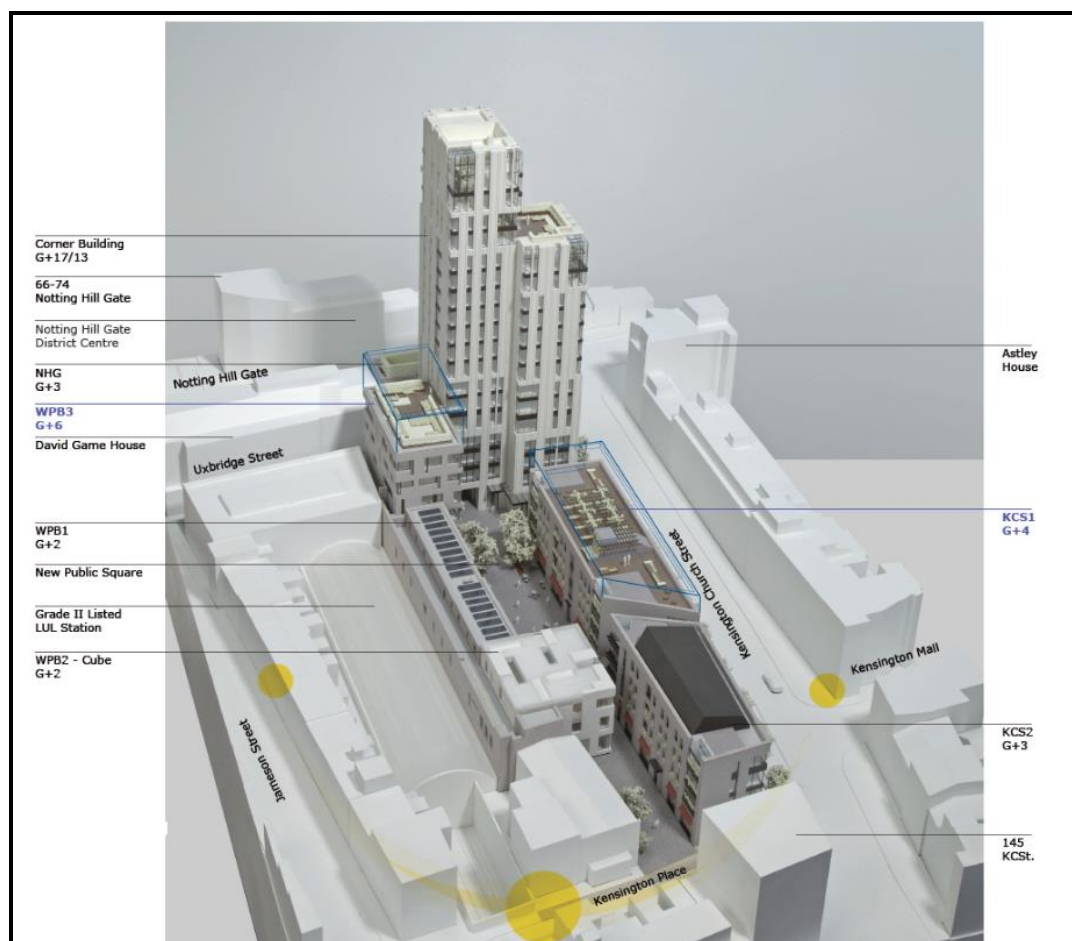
proposed aerial view, with additional massing of amended scheme outlined in blue.
